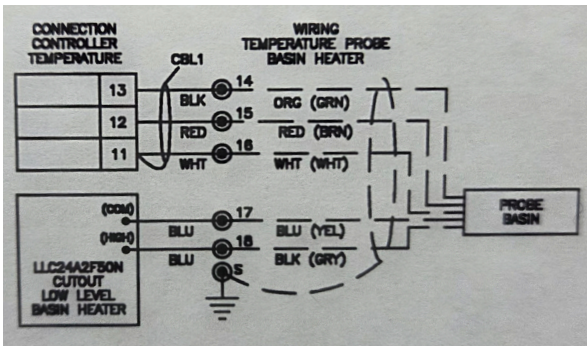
Probe RTD Wire Colors Panel Door Drawing
